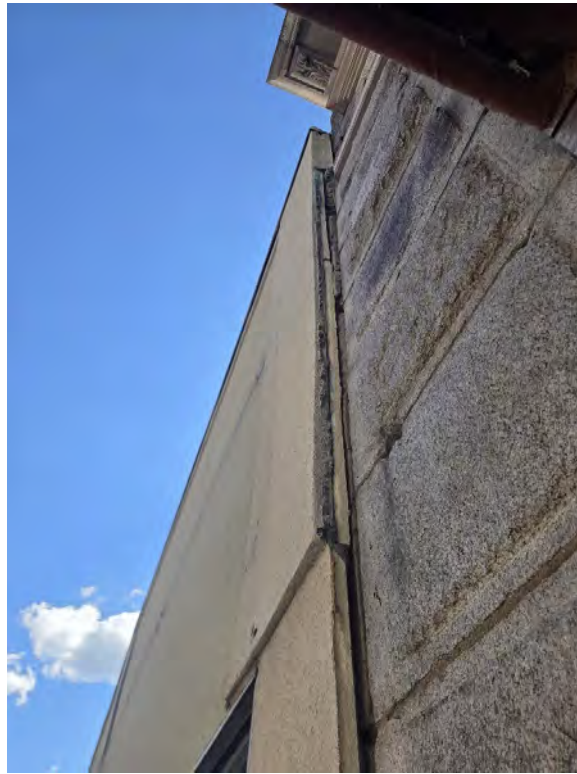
Front Façade of Building Featuring Exposed Styrofoam
